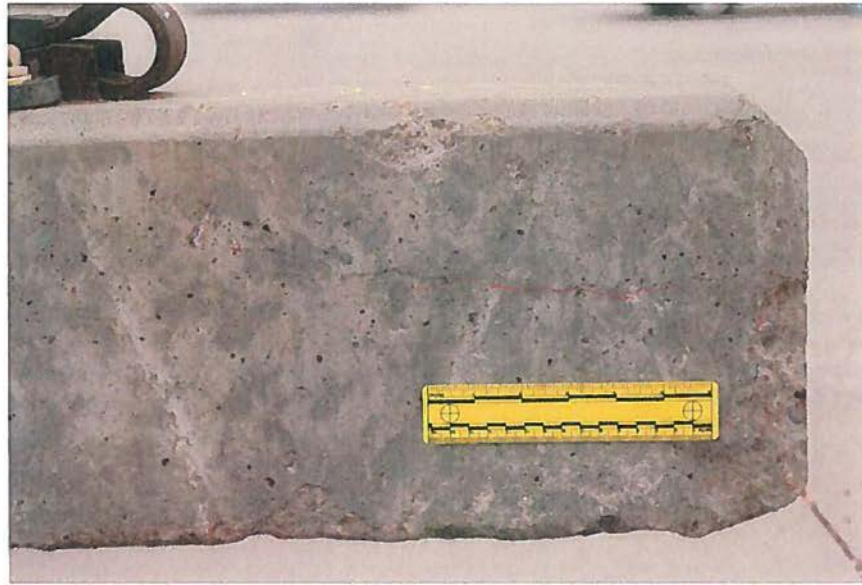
Closer view of side of tie NDT #7 at south end, outlined crack extends 6 inches from end. L3672 102312 13
